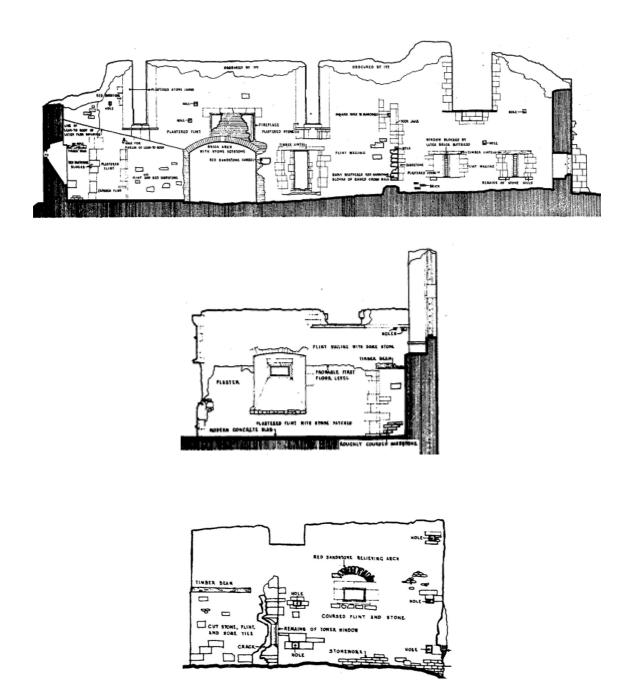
c: Internal elevation of south-west wall (top) plus internal and external elevations of the south east wall (middle and bottom) (W A V Nutall, July 1961, "medieval field study", The School of Architecture, Liverpool College of Building)
